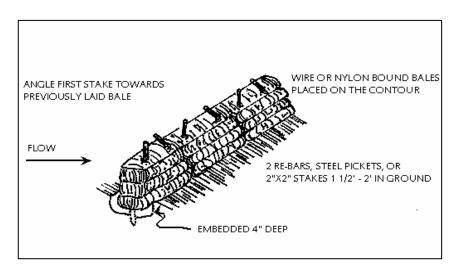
Straw Bale Barrier Installation Requirements
